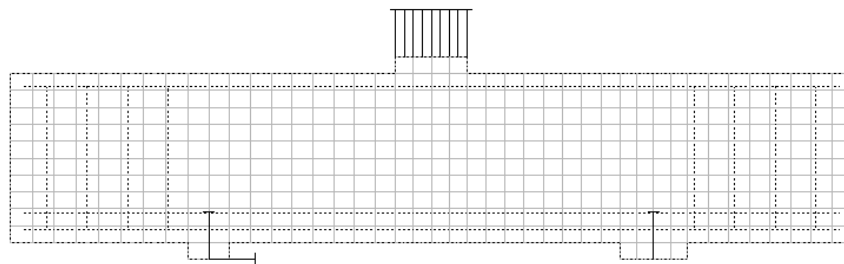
Finite element mesh and boundary conditions of short span beam (beam A0)
